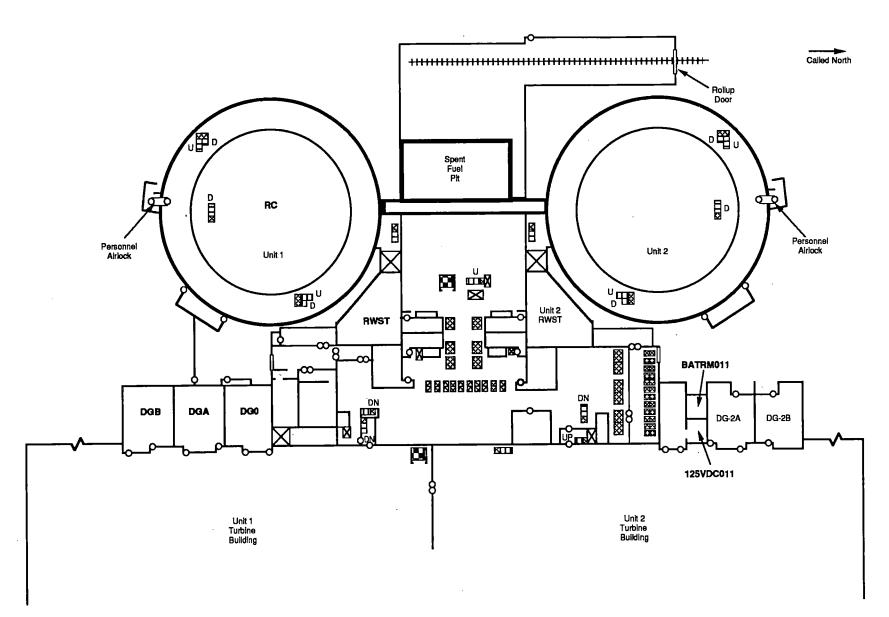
Zion 1 and 2 General Arrangement, Elevation 592'
